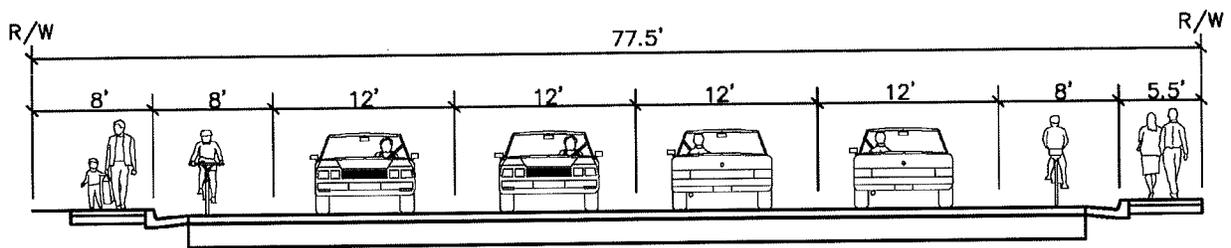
Segment 1 – Interim Roadway Section with Street Parking (Looking East)
